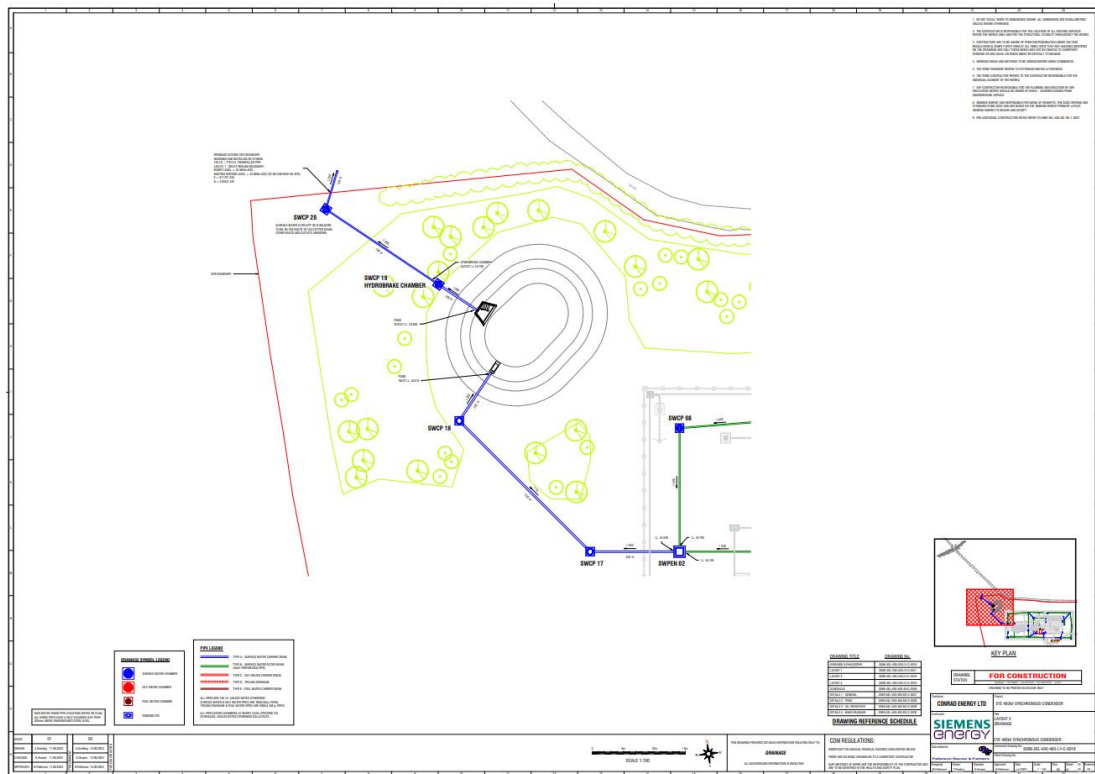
Surface Water Drainage Plan (Drawing ref: D069-SEL-V00-400-LY-C-0018)
